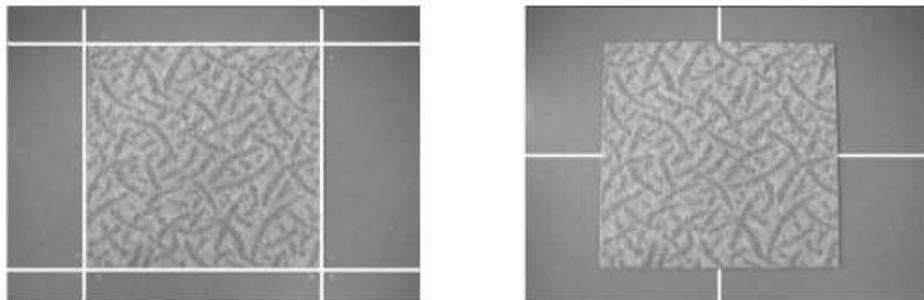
Two different modes of carpet tile installation on raised floor panels: aligned (left) and offset (right). White lines indicate the floor panel edges.
